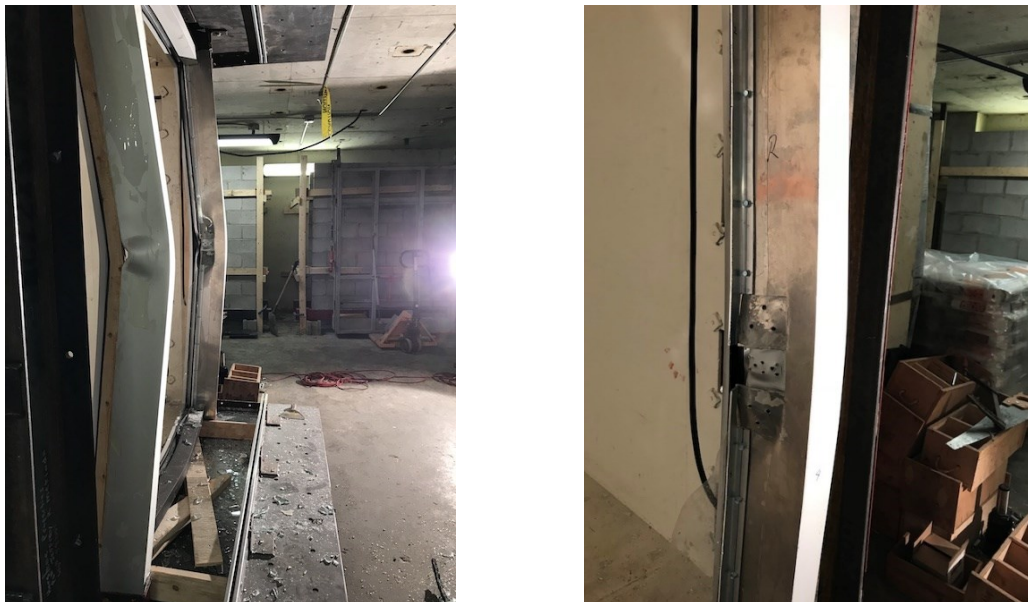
13 : Damage to vertical mullions (left) and failure of the mullion connection (right)
